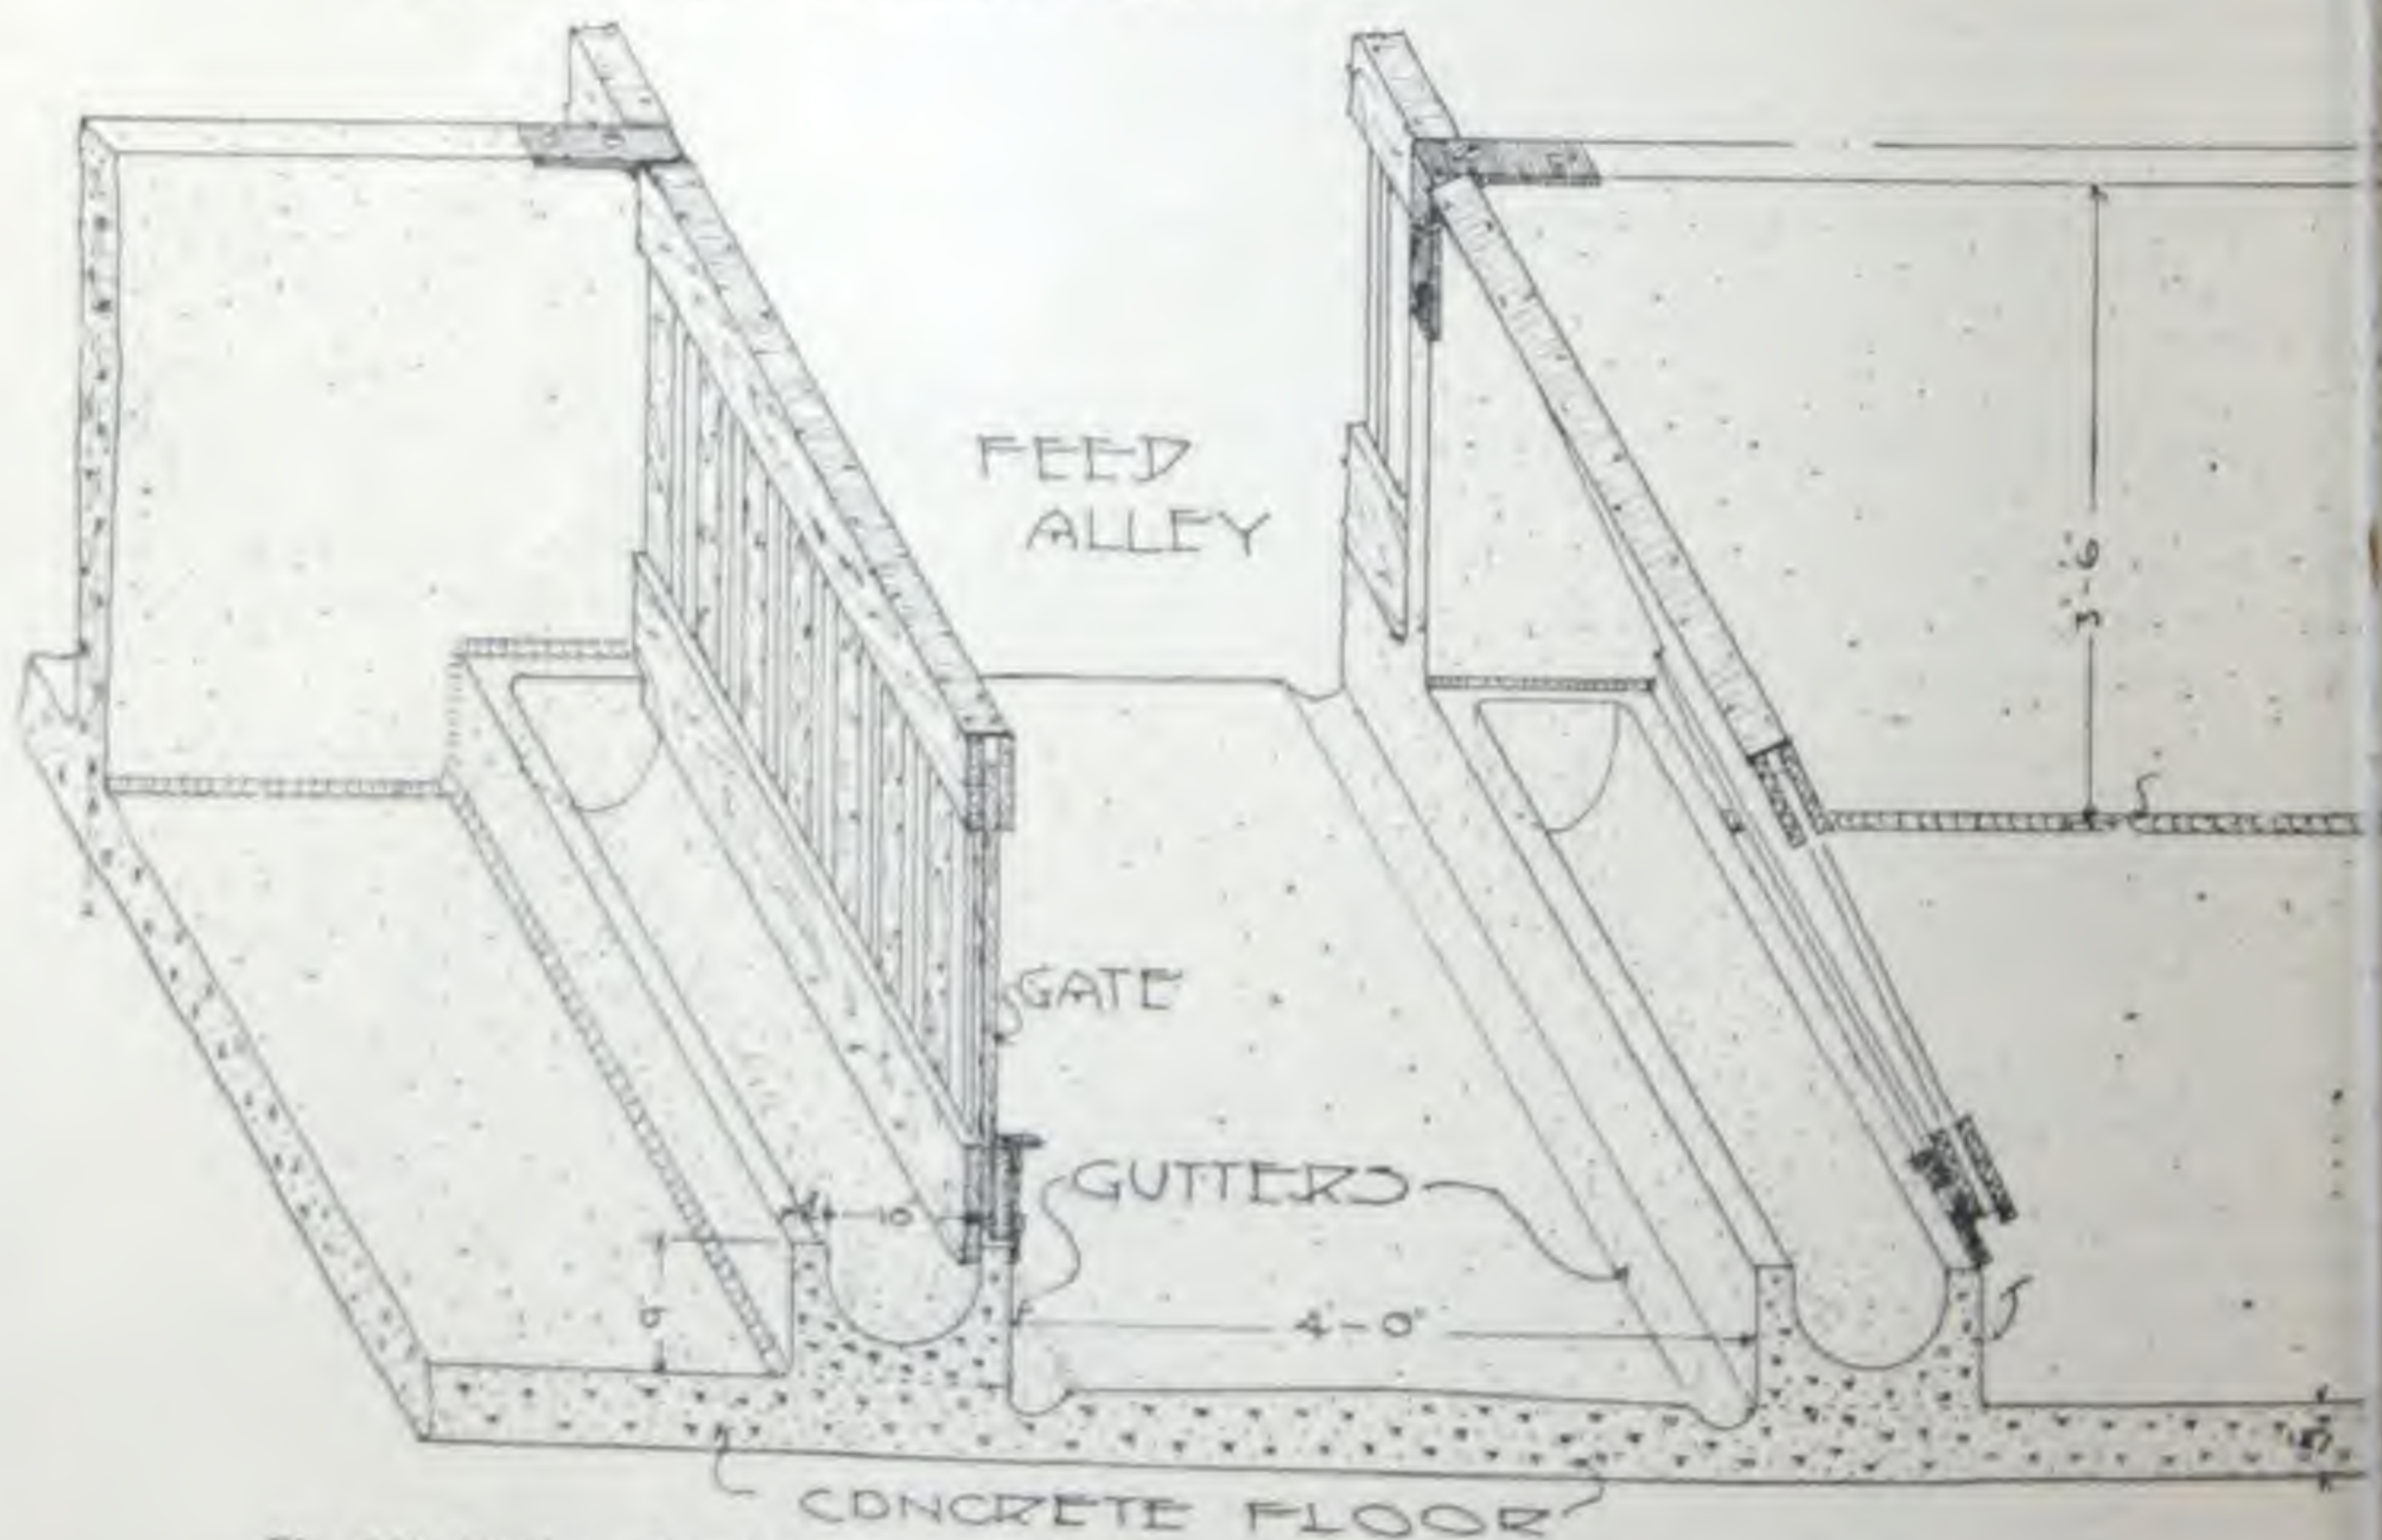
Section of model hog house showing partition walls, feeding troughs, gutters, etc.
